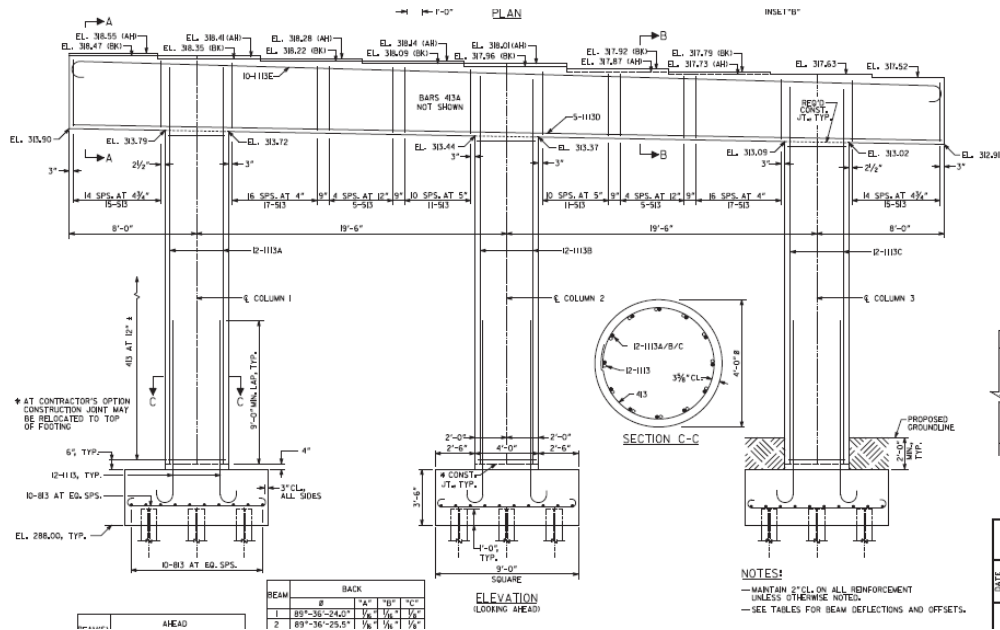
Drawing. Abutment drawings for Span 14 of Bridge 11B
